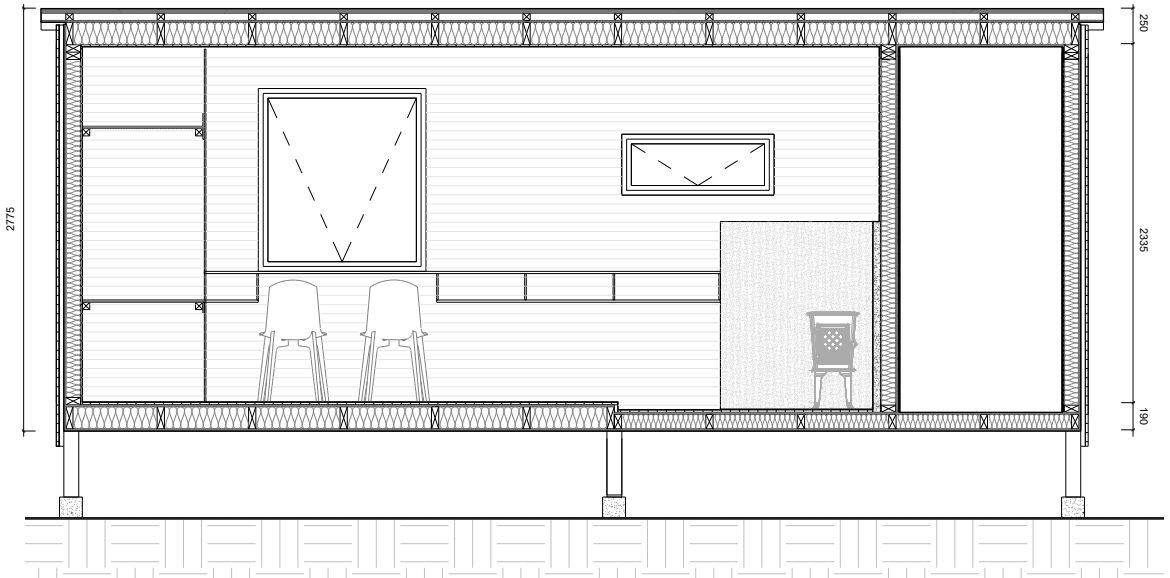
SECTION B-B OF THE BUILT CABIN. SCALE 1:50
